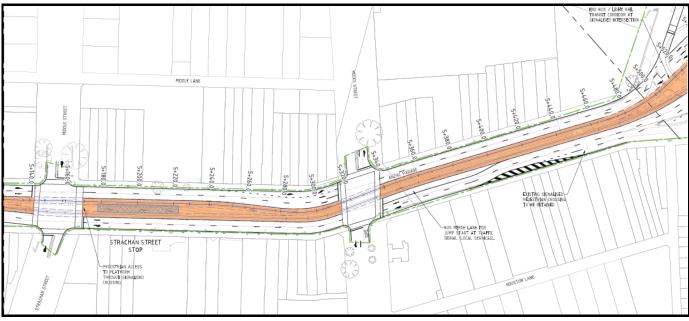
Anzac Parade (UNSW to Nineways) – Proposed Conditions
